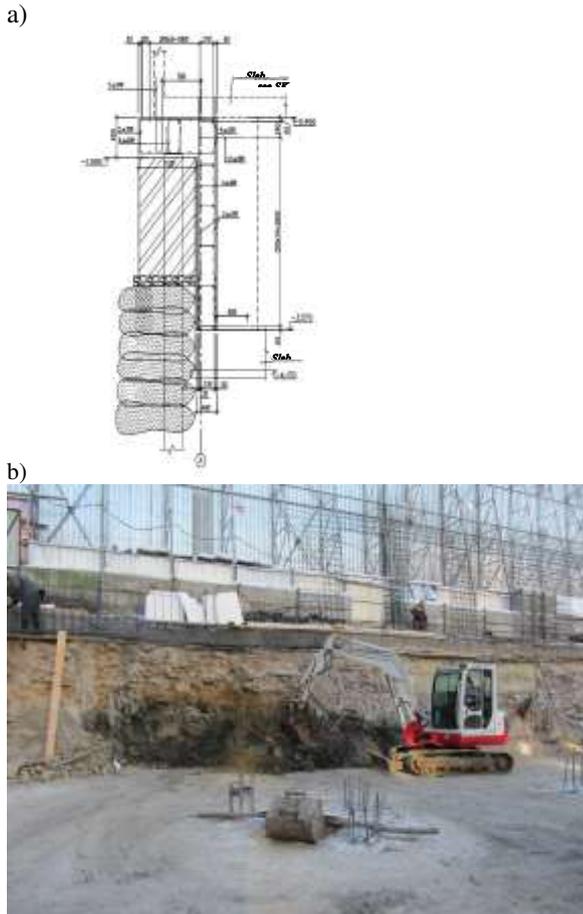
Schematic view of foundation underpinning using jet-grouting pile technology (a) and works to demolish soil-cement areas for construction of protecting wall (b)
